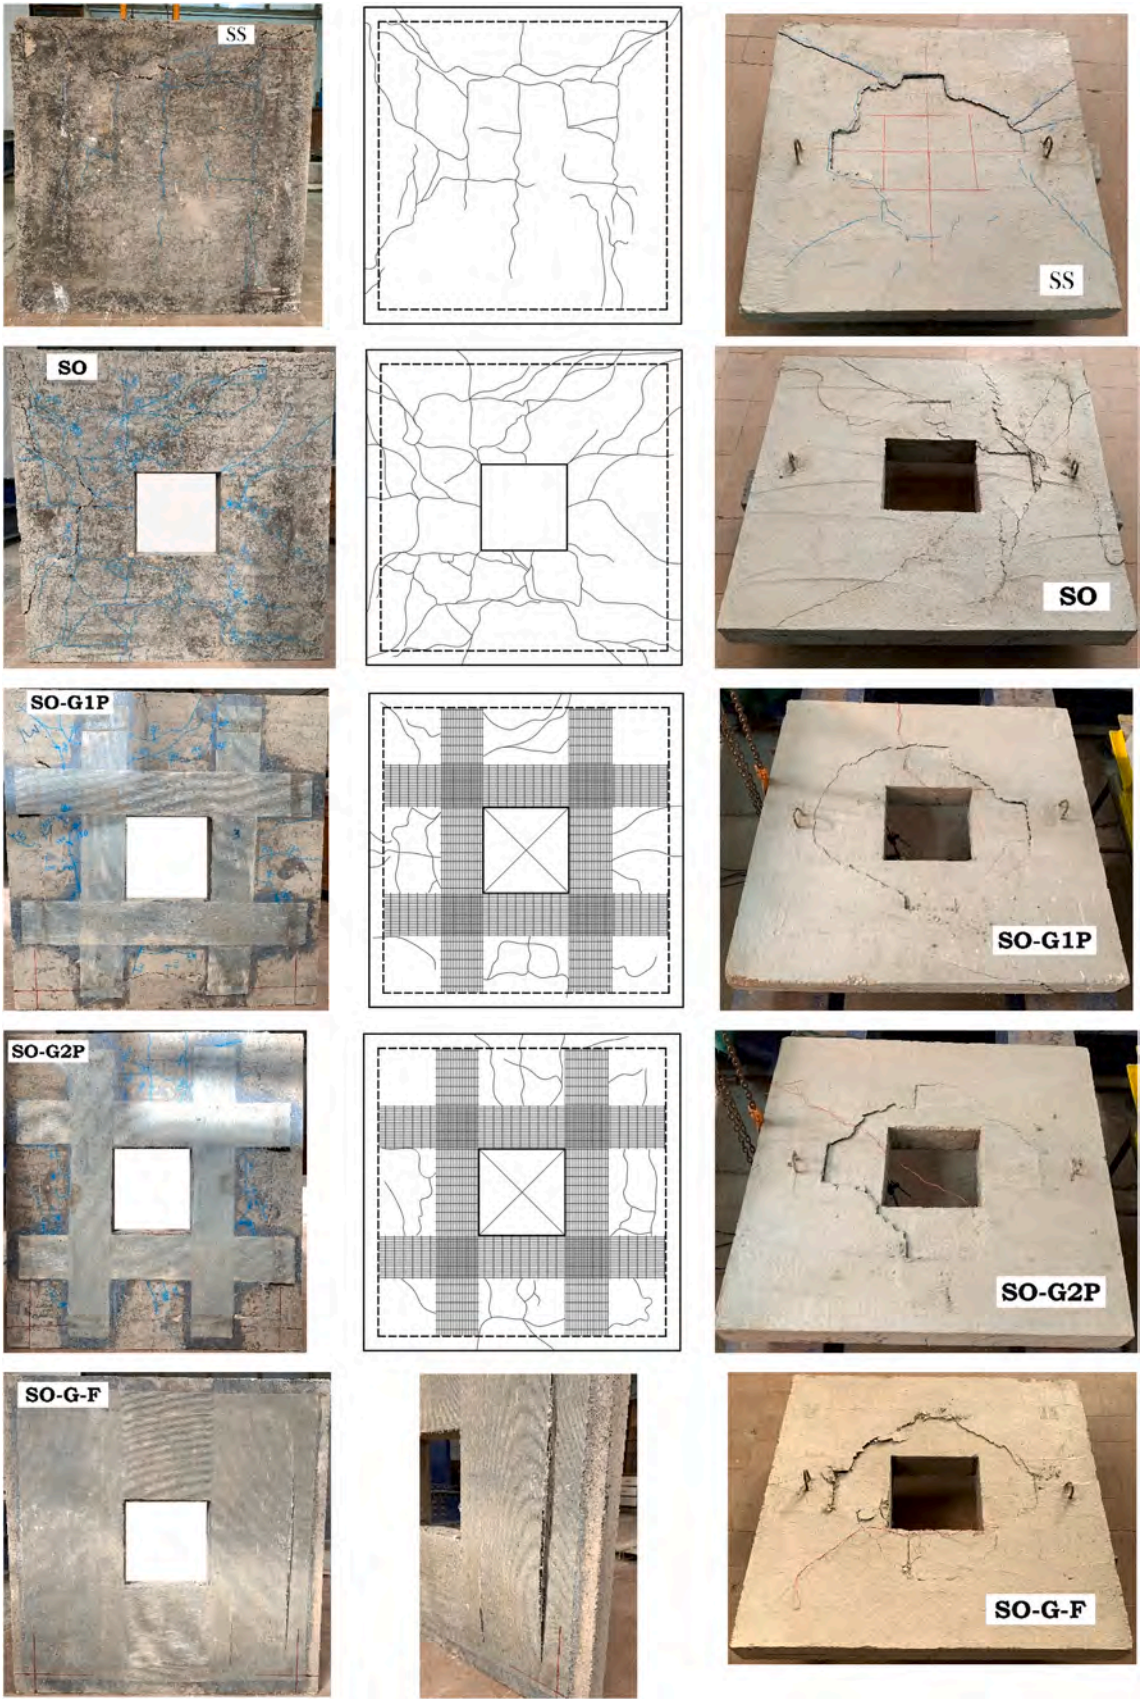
Crack patterns at the bottom and top surface of all tested specimens.
